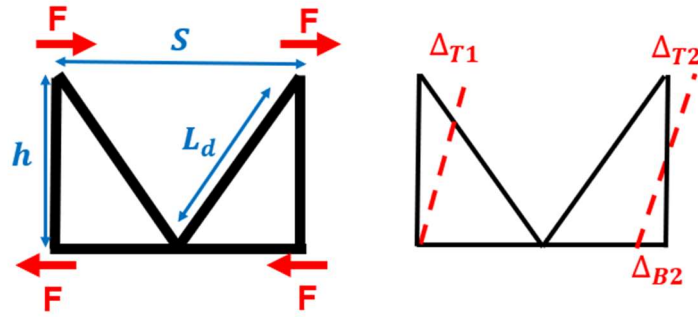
Twin Girder K-Frame Brace Stiffness Idealization
